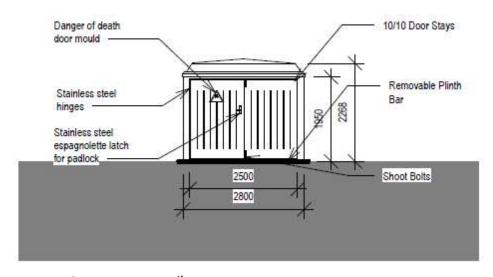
Proposed Elevation Extract (please note a larger version of plan can be found in the Committee Plan Pack)
